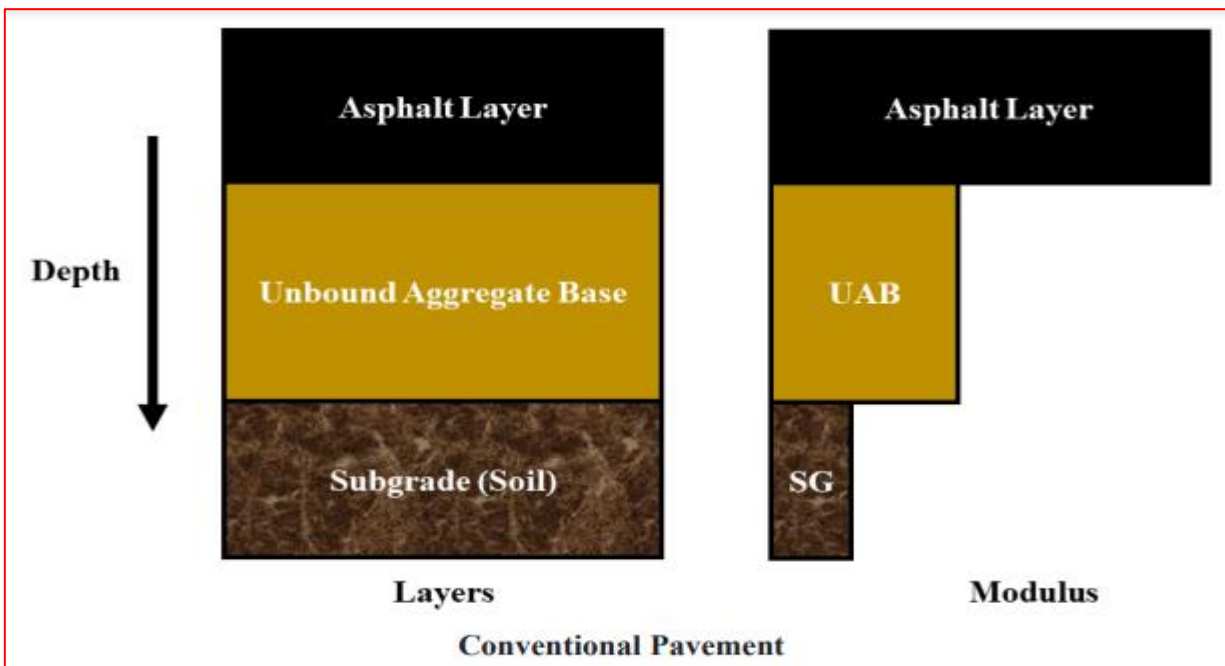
Schematic Layer for traditional road (conventional pavement) systems
